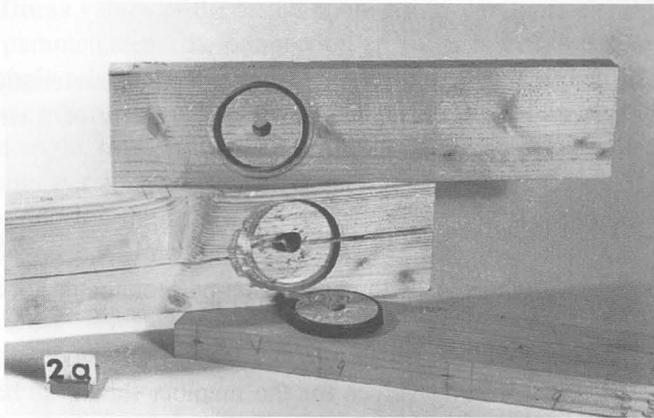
Embedding-splitting failure of a ring connection loaded in compression.
